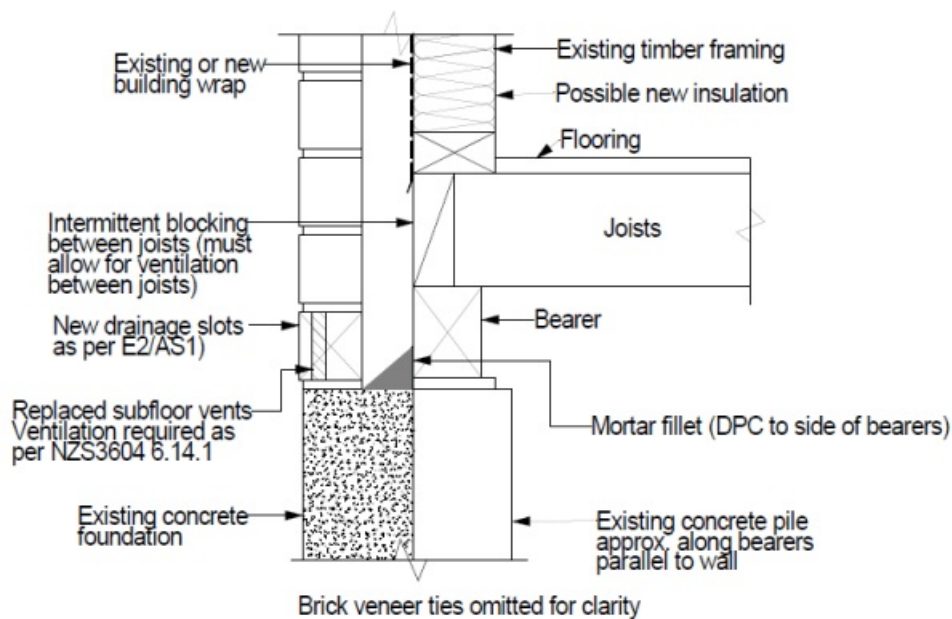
Ventilation and drainage requirements when bearers parallel to the wall when no ventilation is provided in the perimeter foundation.
